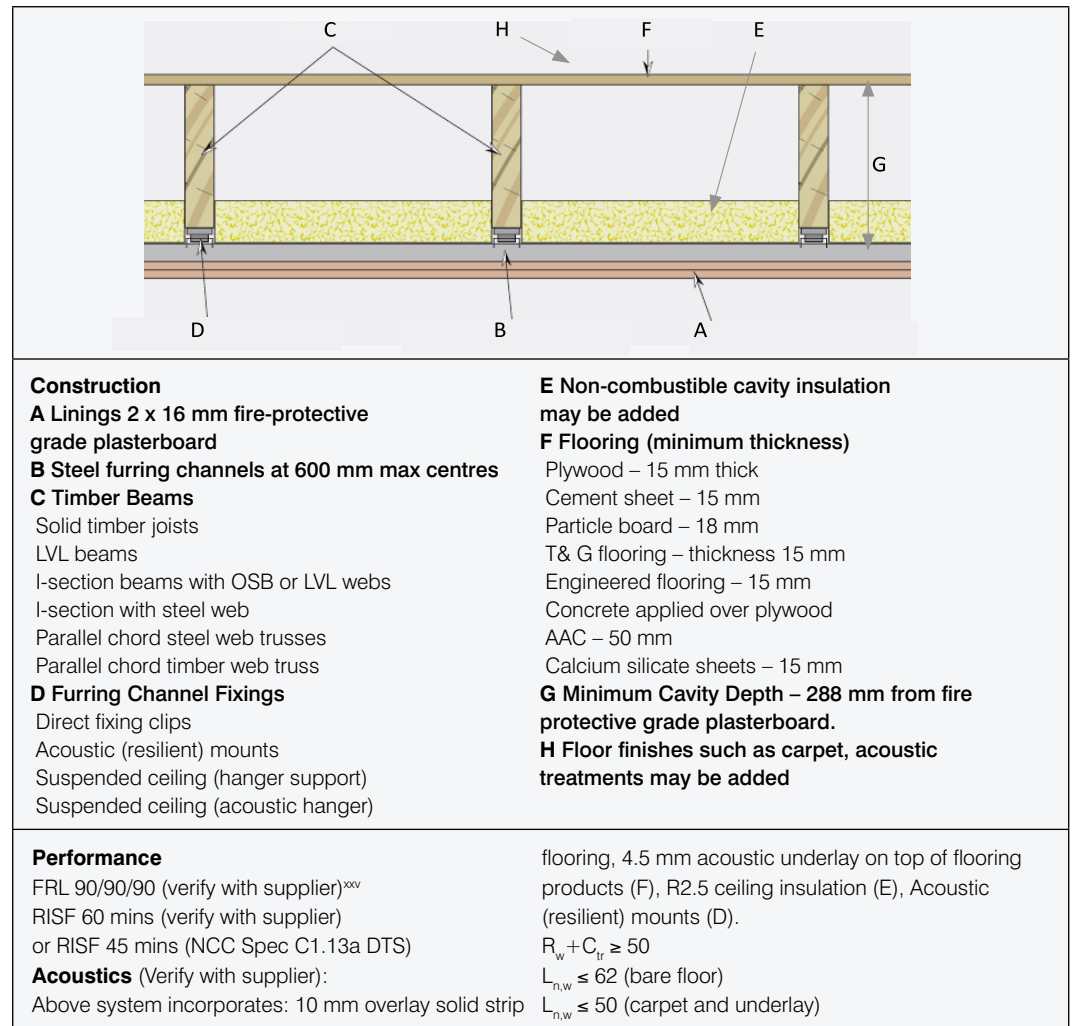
Sound performance of typical timber-framed floor/ceiling system.
